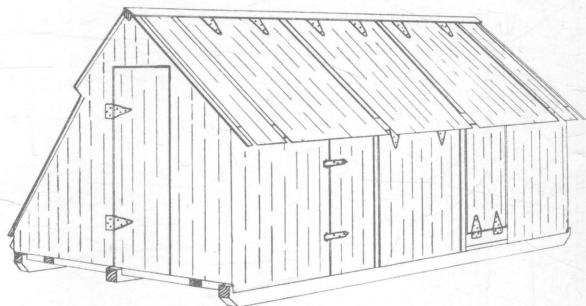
Front plan sketch of house shown in Fig. 5 or plan No. 02602.
